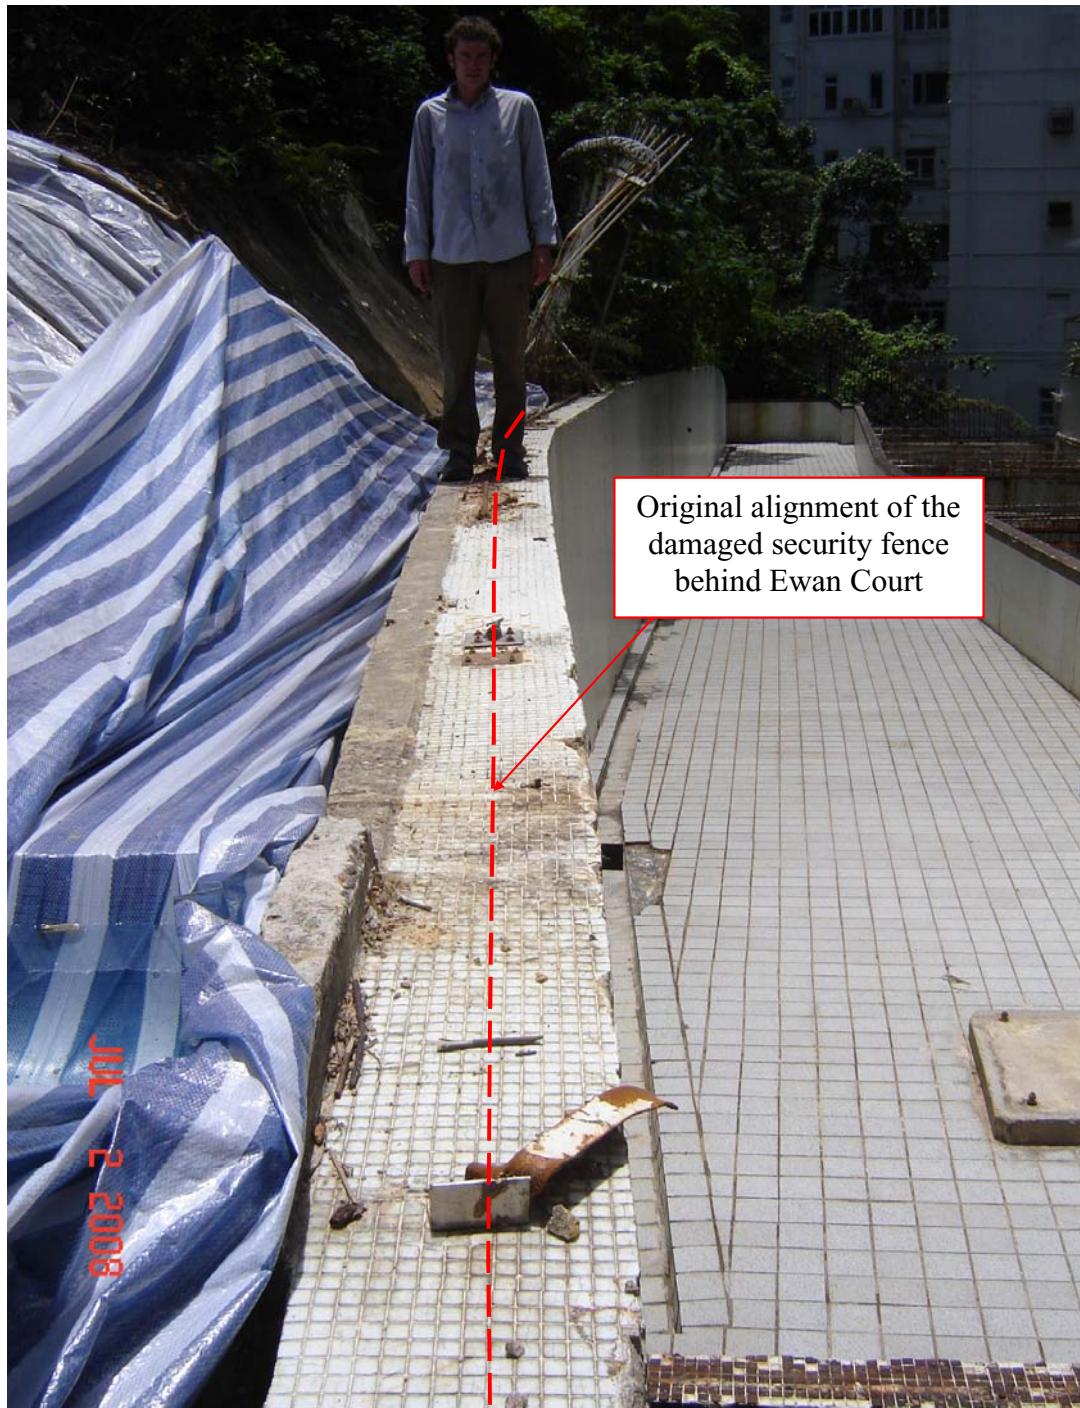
Damaged Security Fence at the Crest of Retaining Wall of
